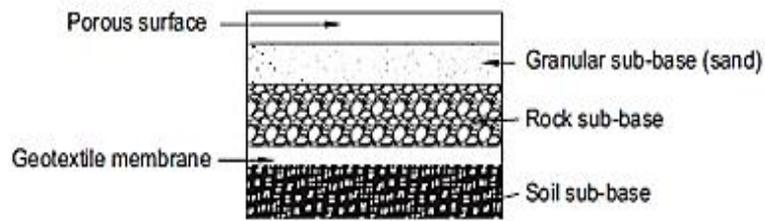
2: Porous/Pervious pavement system (Li and Hunt, 2013)
